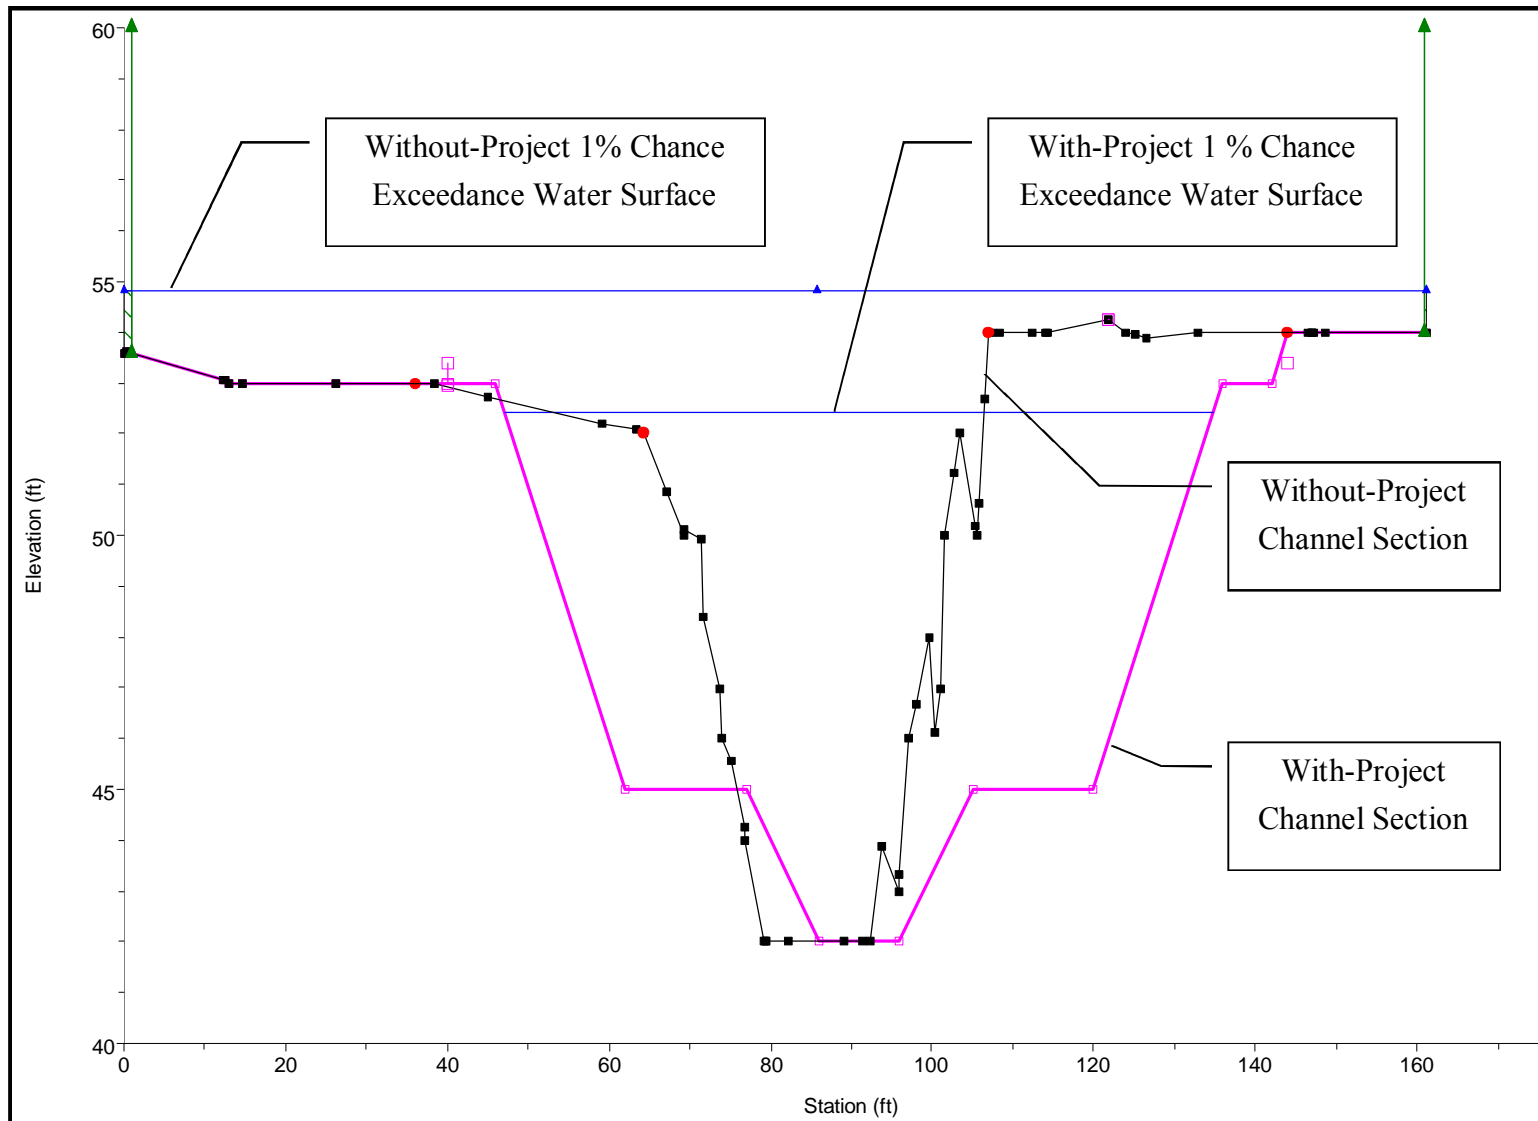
Typical D/S section, with- and without-project geometry for Alt. 3B
